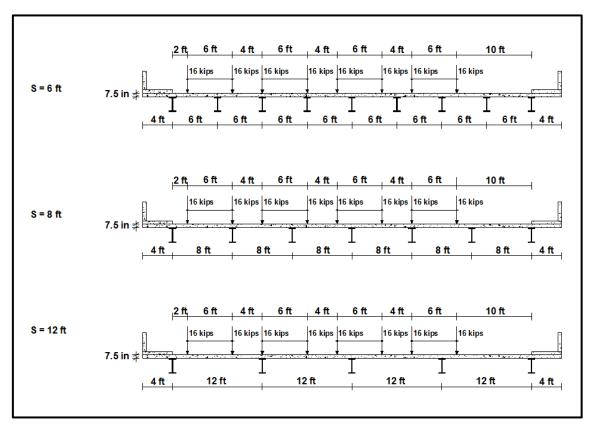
Typical Cross-Section of Four-Lane Bridges (Case 2SR) and the Critical Transverse Position of HS20 Trucks for the Different Girder Spacing Considered
